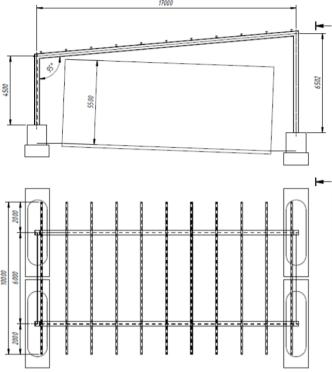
Design cross-section of monopitch roof (top) Variant of a structural element (bottom) [2].
